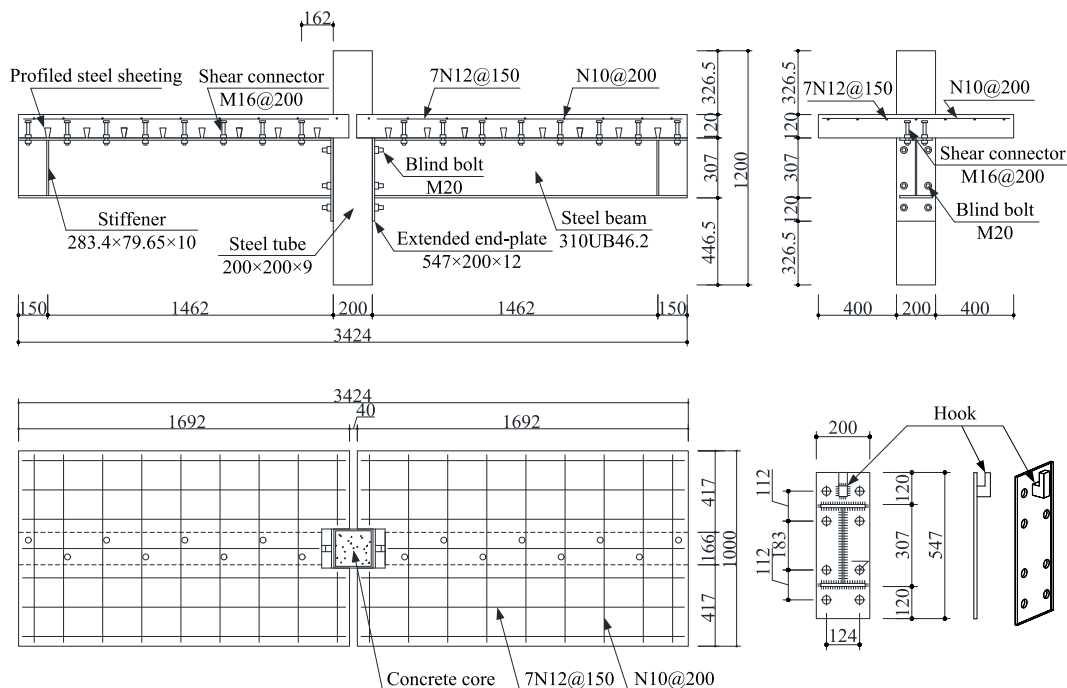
Detailed geometry of specimen BCJ-1 (Units: mm).
